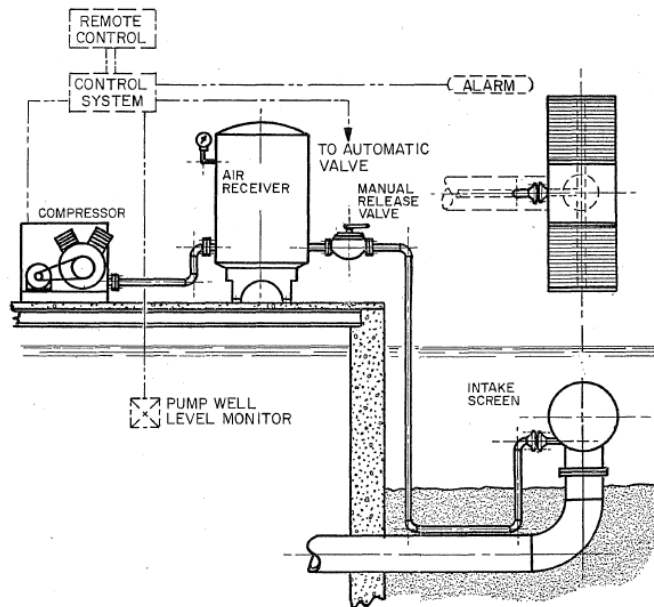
Sketch of a Typical ABS Design (Ref. 6.8)
